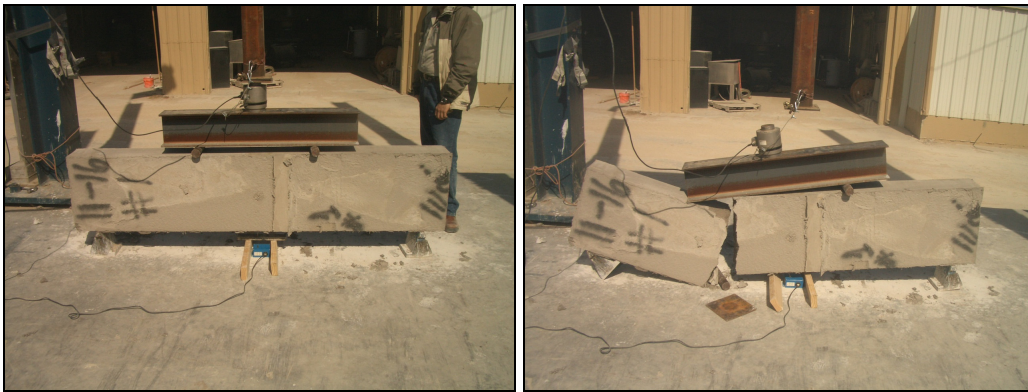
Beam for 1<sup>st</sup> batch concrete cast on 11/16/06 for 56 day test;
